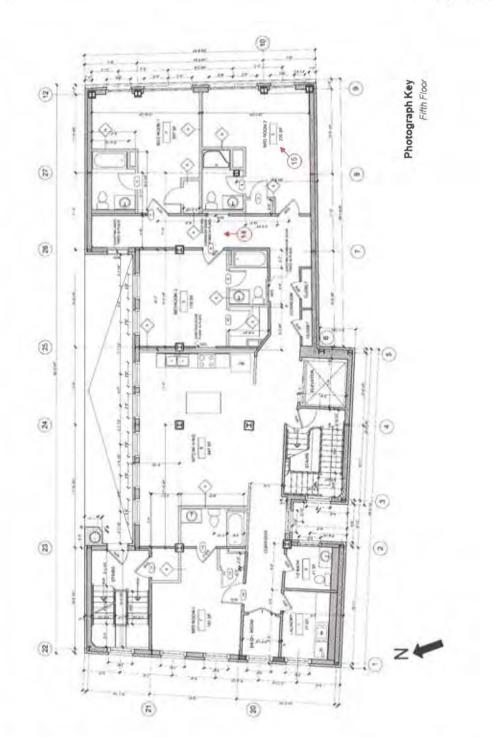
Fifth-floor plan (2016), showing interior photo numbers and views. Reproduced by permission from the building owner.
